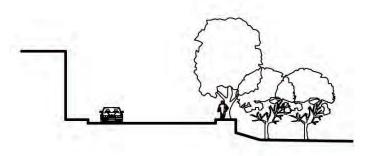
Local Street Cross Section of New Entry to Research and Development Site
